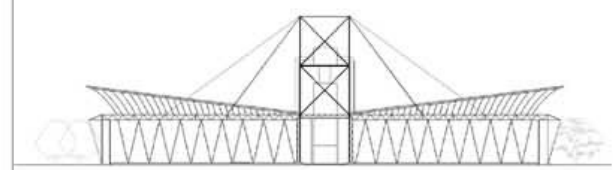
DETAILS FOR STRUCTURAL EXPRESSIONISM(SPECIAL STUDY) SCALE 1:20
